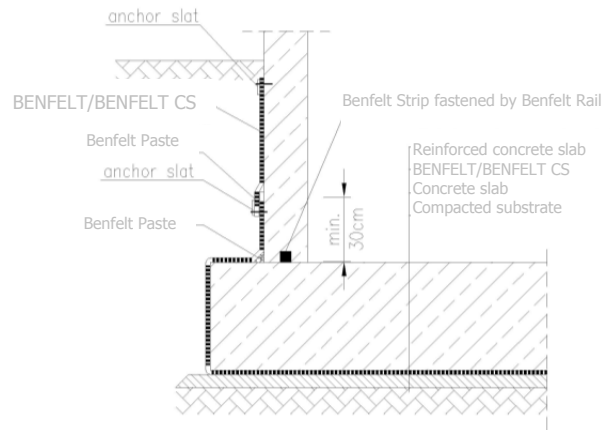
Passage of the horizontal insulation onto the foundation wall in case of a board with offset - Variant II.
